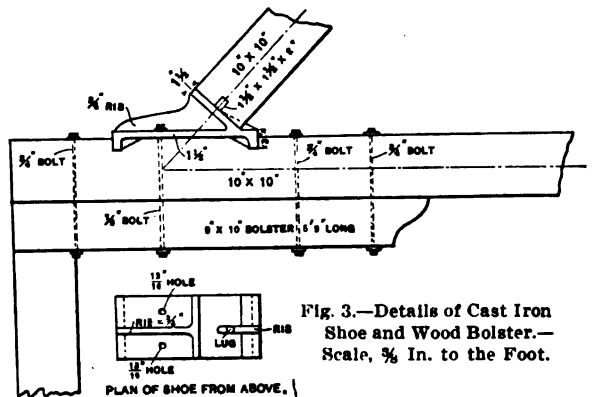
Details of Cast Iron Shoe and Wood Bolster.—Scale, 3/8 In. to the Foot.
